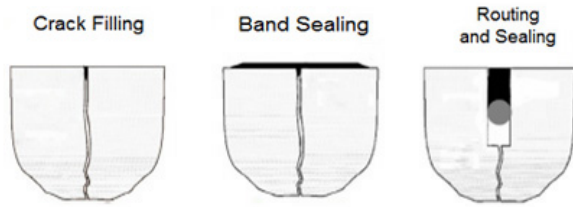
Type of Crack Repair Methods (Hwang et al., 2014)
